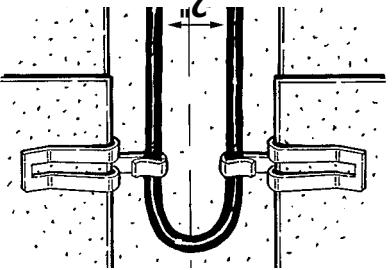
Attaching clips to shingles at edge of roof without gutters
